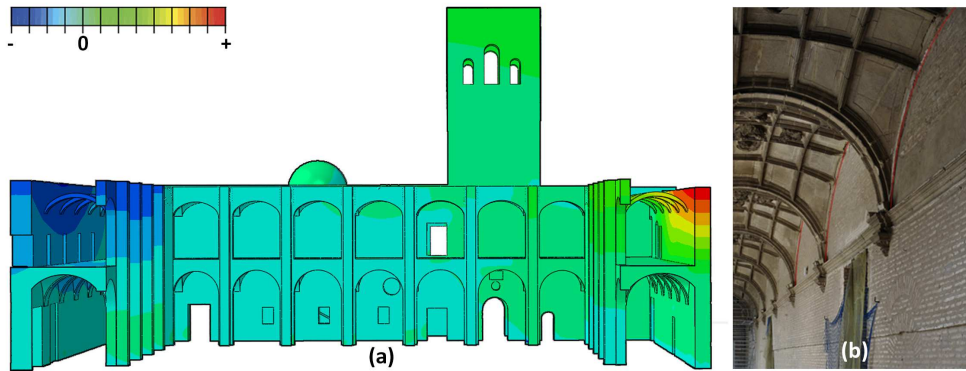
Section through West and East wings (a); Displacements along the X axis (b) and cracks between vaults and wall in the East wing.
